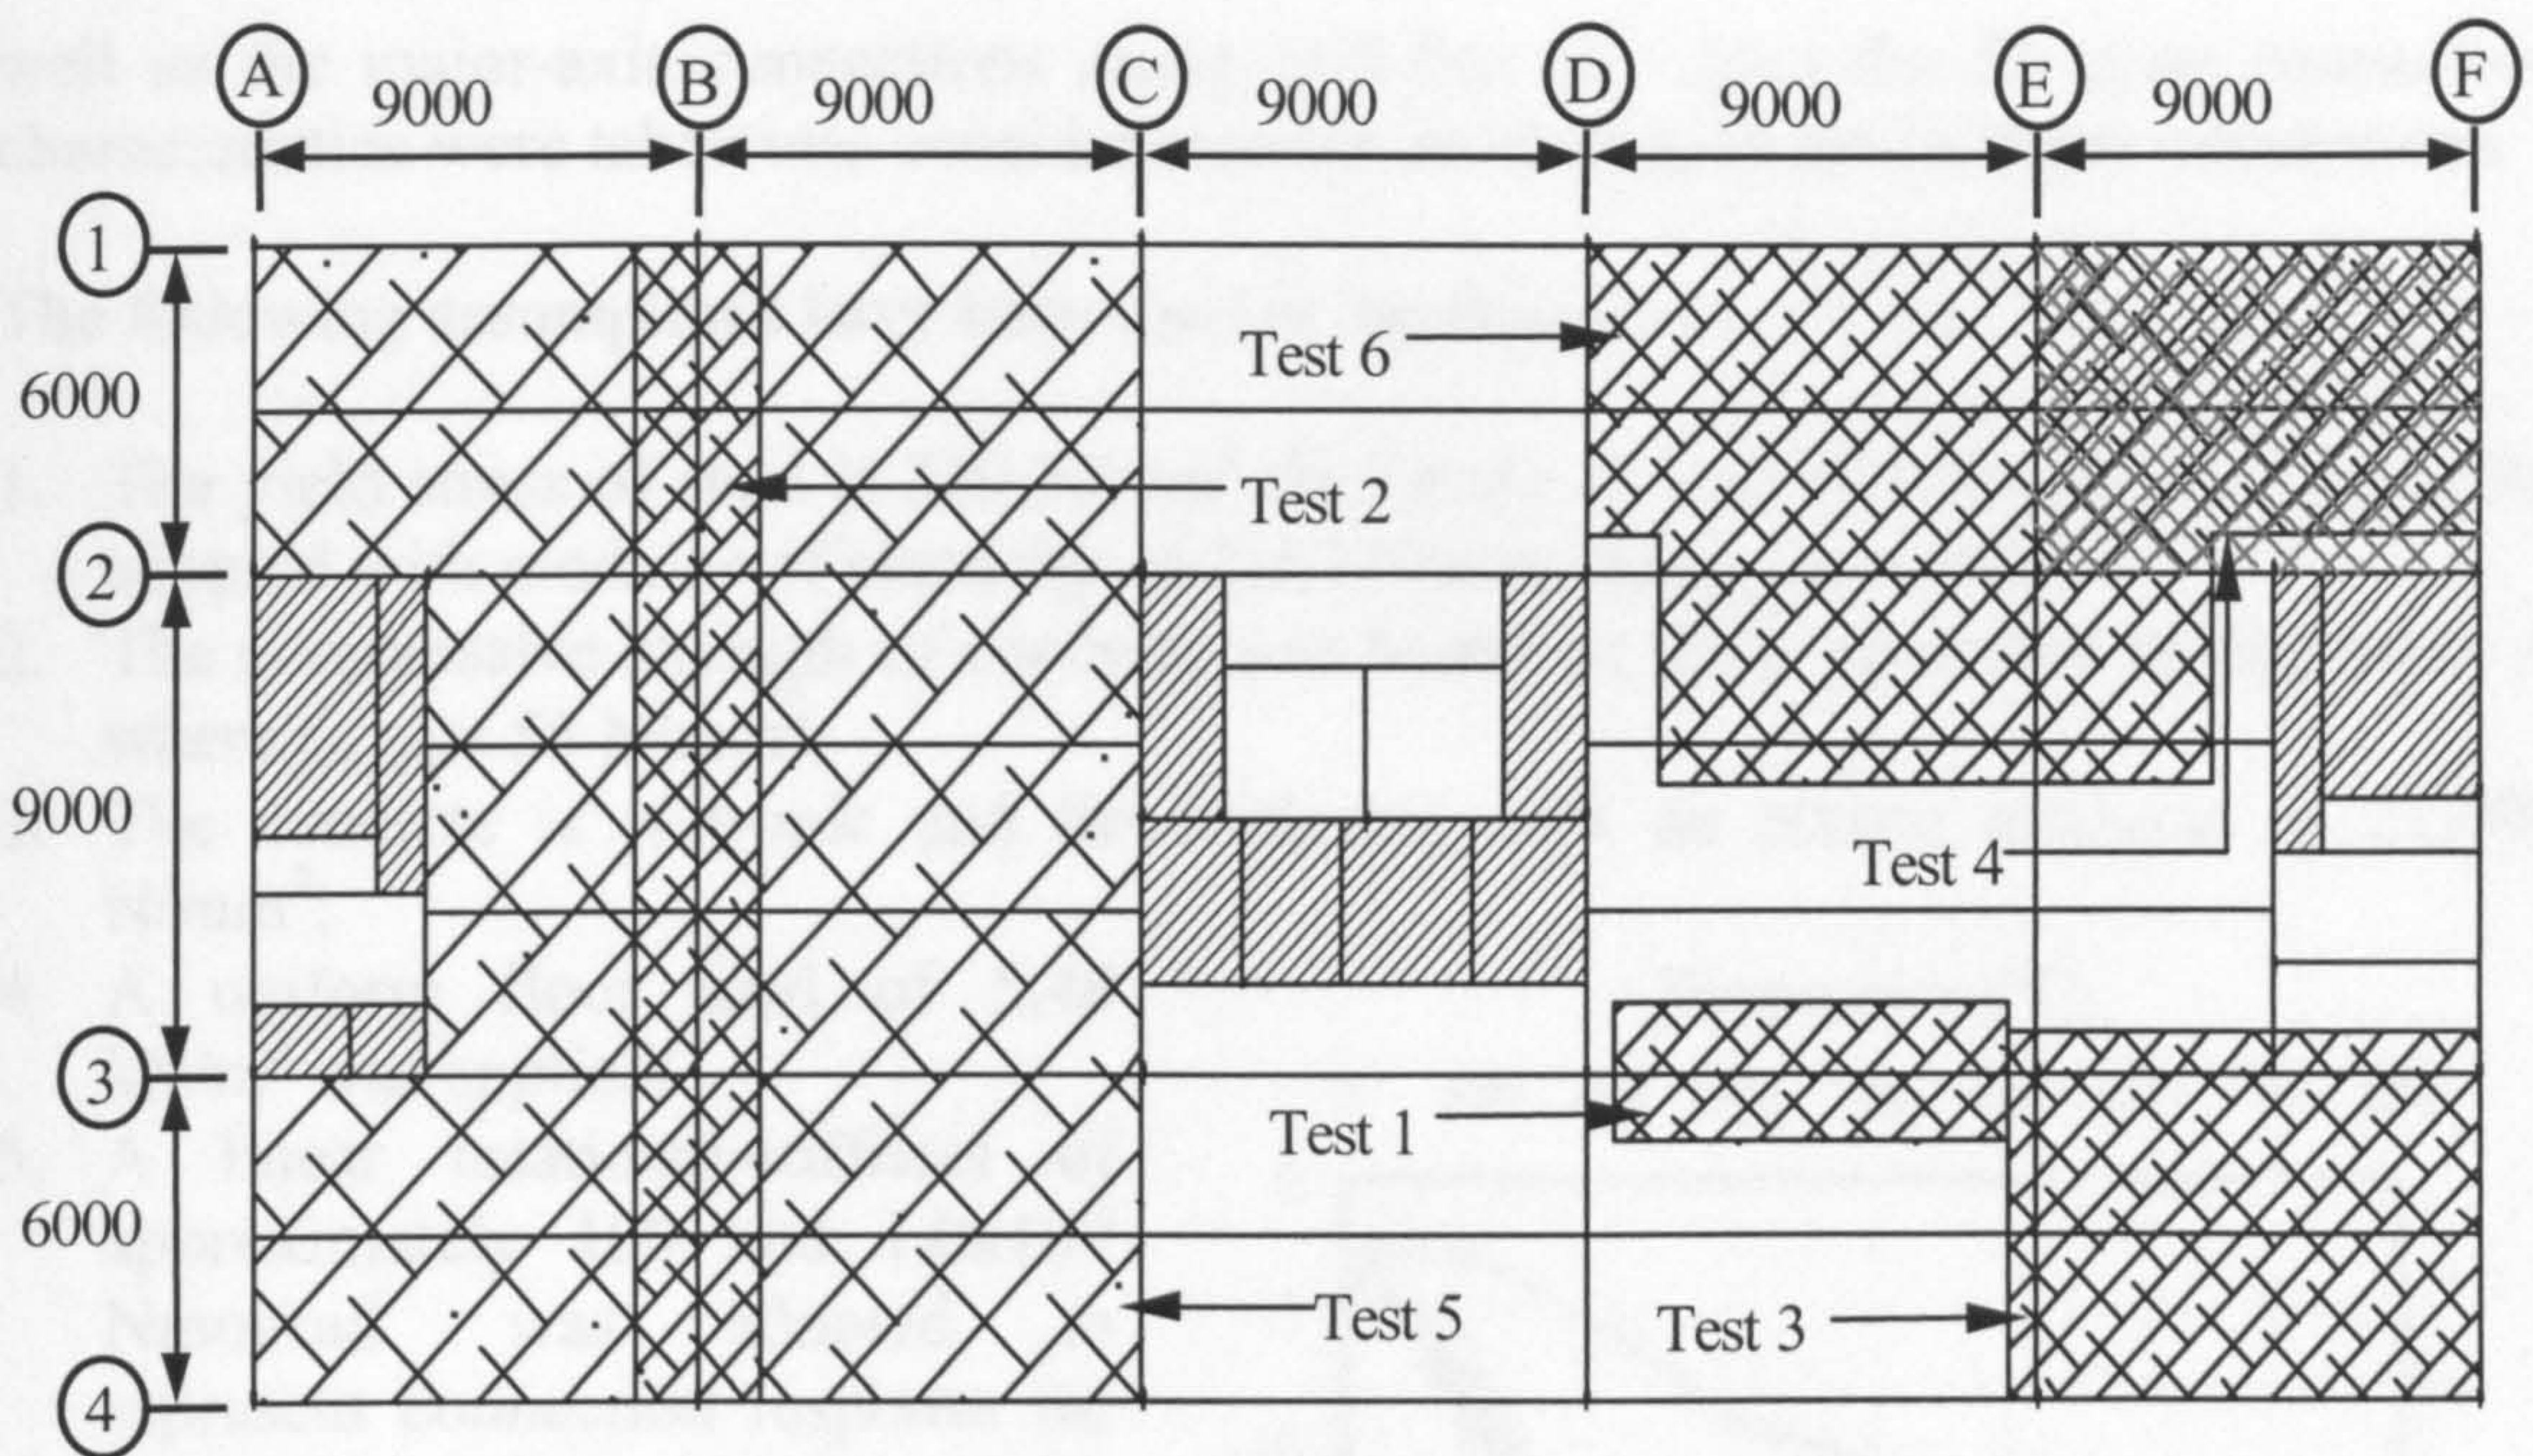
Floor Plan of Cardington Test Frame Showing Location Fire Tests
